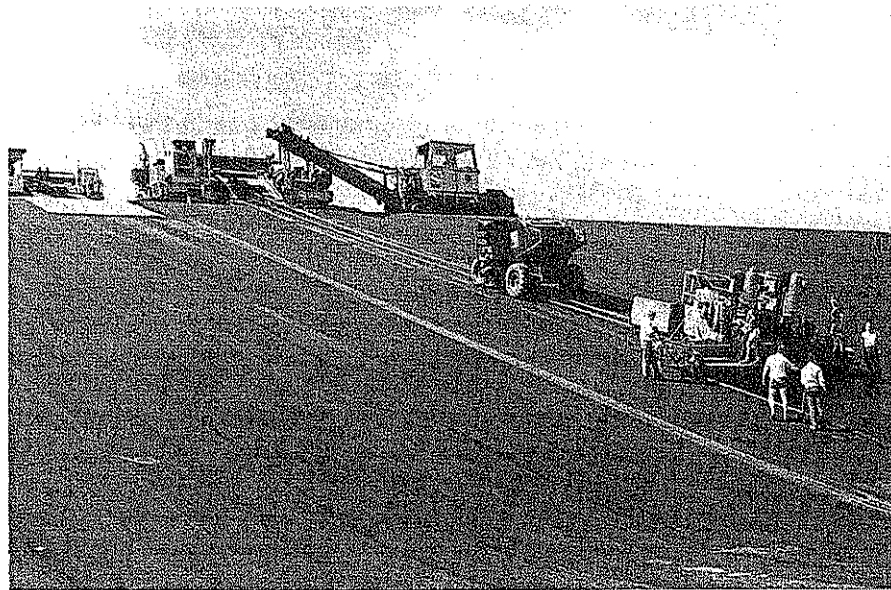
Face sealing of asphaltic concrete. Placing procedure and equipment (courtesy of Strabag Bau-AG).
